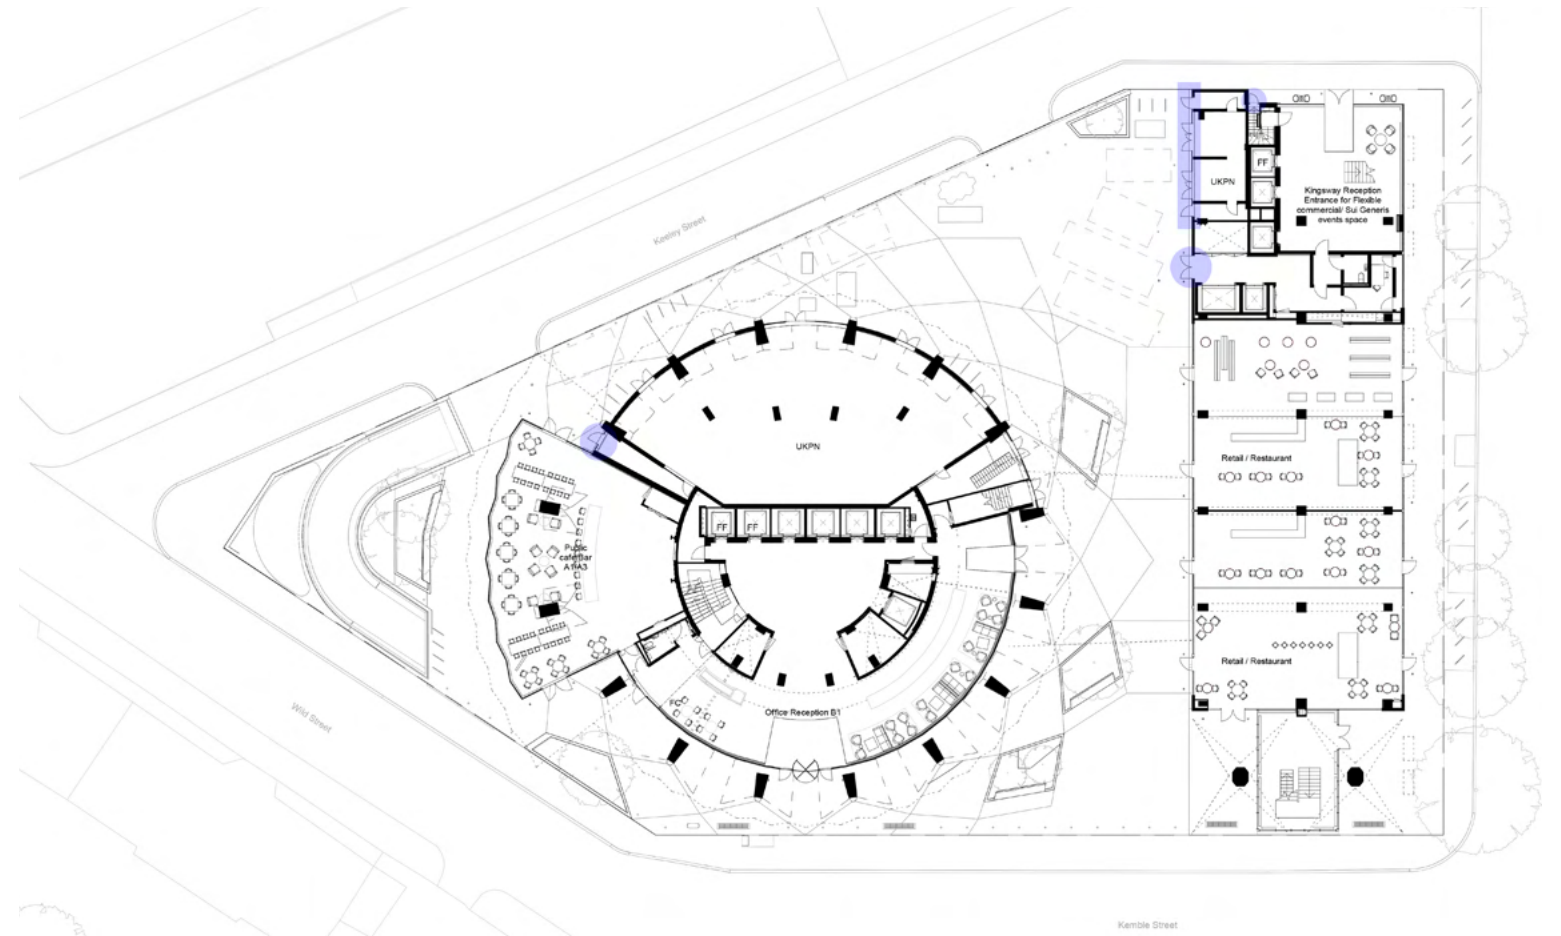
Ground Floor Plan - MAT 07 location
